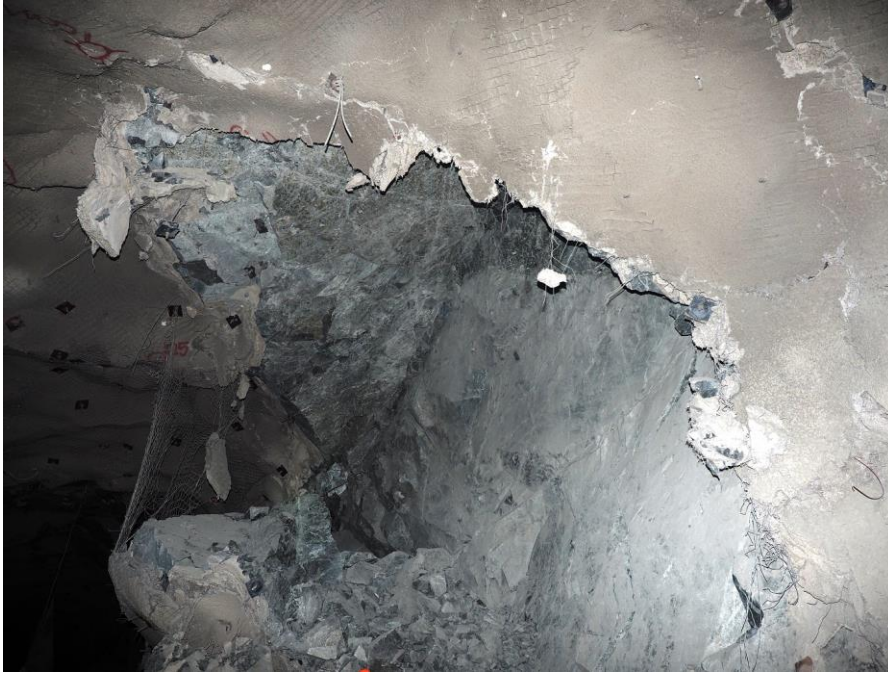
Failure of reinforcement elements following violent, structurally controlled instability.
